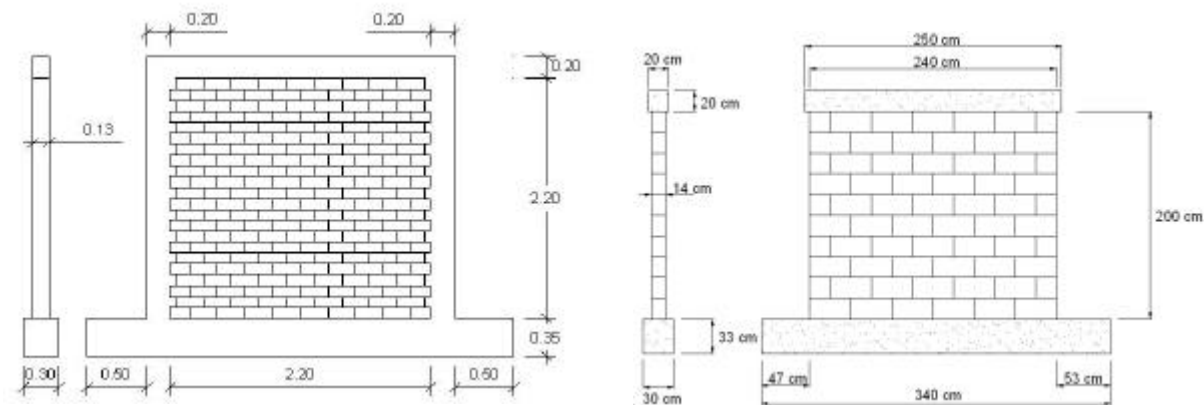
Geometry of Confined Wall W1 (left) and Reinforced Wall W2 (right)
